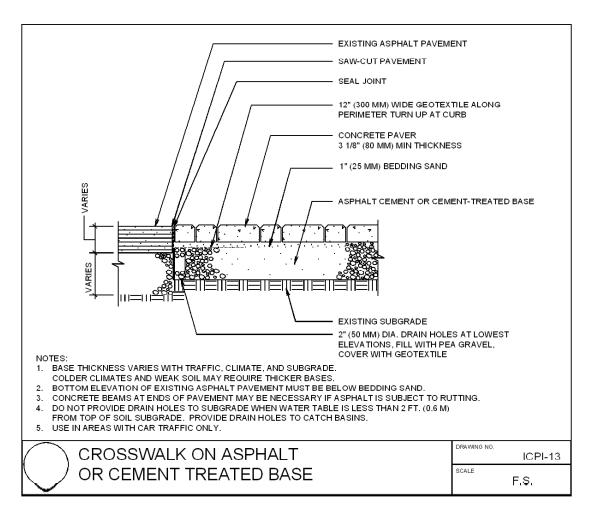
Typical Interlocking Concrete Block Design Detail for a Crosswalk. [3]
